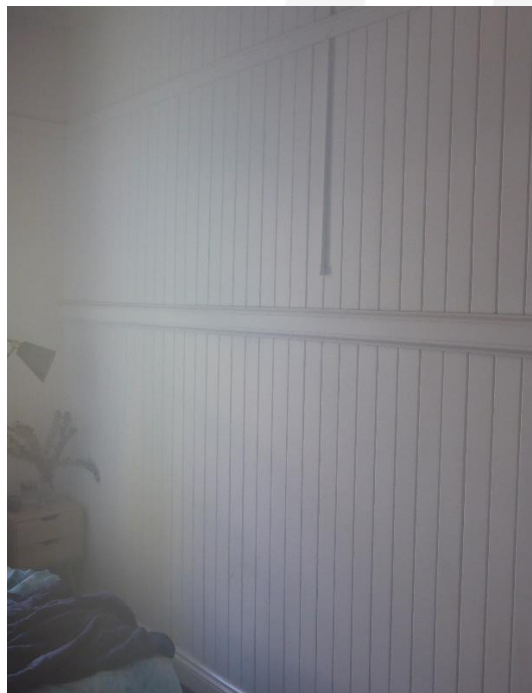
A detailed view of the internal wall construction within the bedroom space of Unit 4. Which shows the timber VJ wall plane in a single skin configuration with waist strapping applied at two levels of the wall plane. (Source: VAULT)
